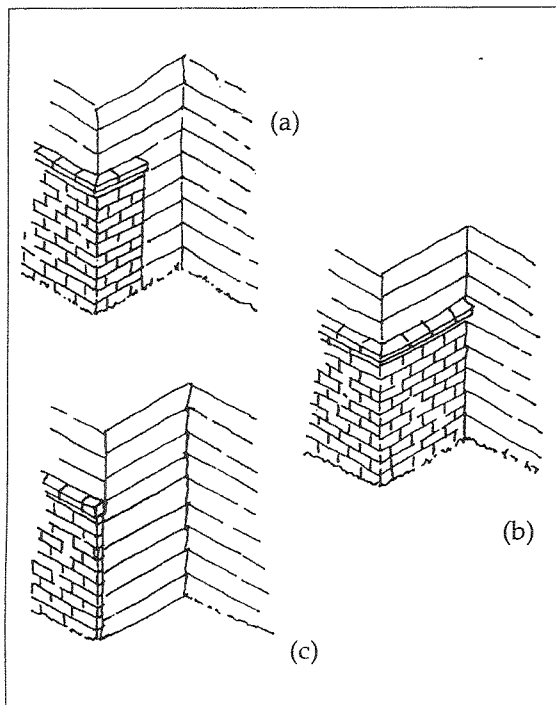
, Facade Consistency. Facade veneers should be returned at least two feet from external corners. In the diagram above treatments (a) and (b) are acceptable, whereas (c) is not.
